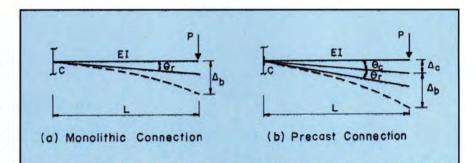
Deformation properties of cantilever beams with monolithic and precast concrete connections.
